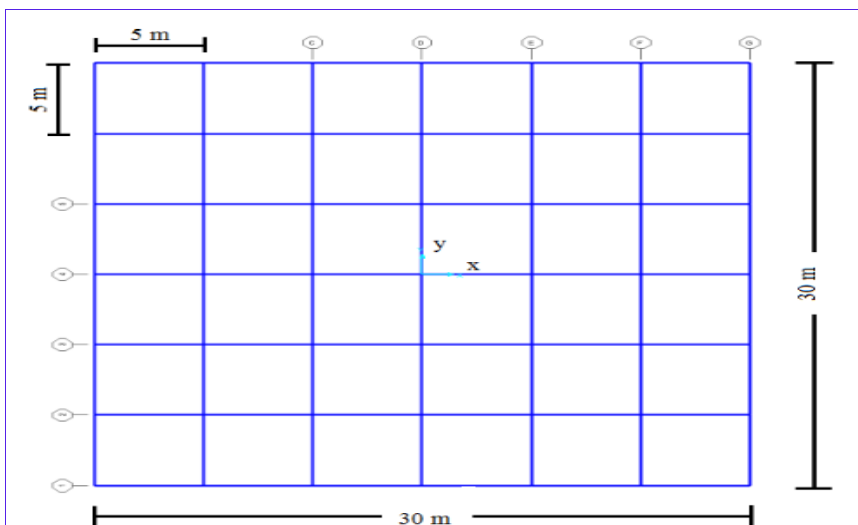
X-Y Plan (Top view cross sections of the beams -W14x38; Columns from 1 to 3 story-W18x106 and 4 to 6 story -W16x36).
